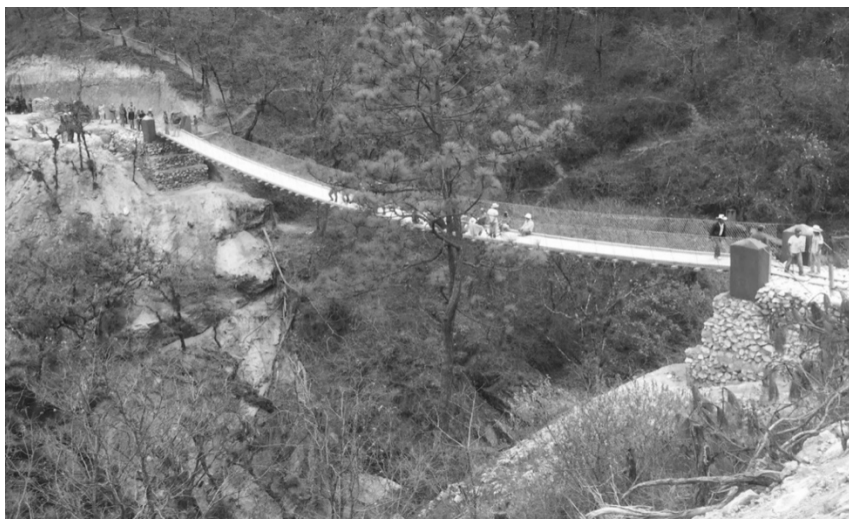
El Temal "Tuk-Tuk" Bridge under Construction
